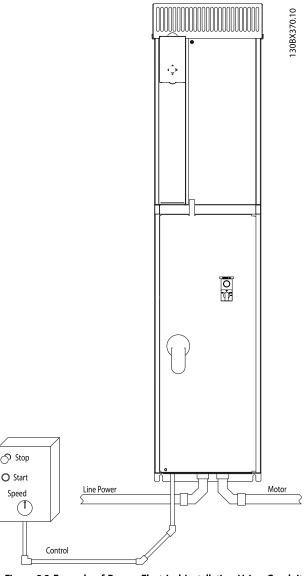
Example of Proper Electrical Installation Using Conduit
